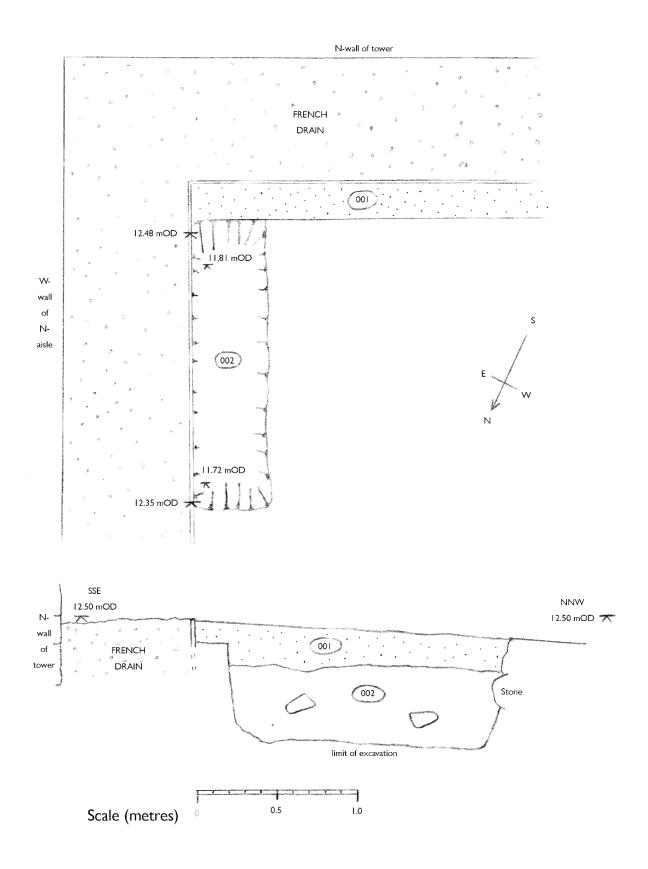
Plan and east-facing elevation of the Rogiet parish church lightning conductor trench, dug and backfilled 25/11/2021. Scale as per drawing.
